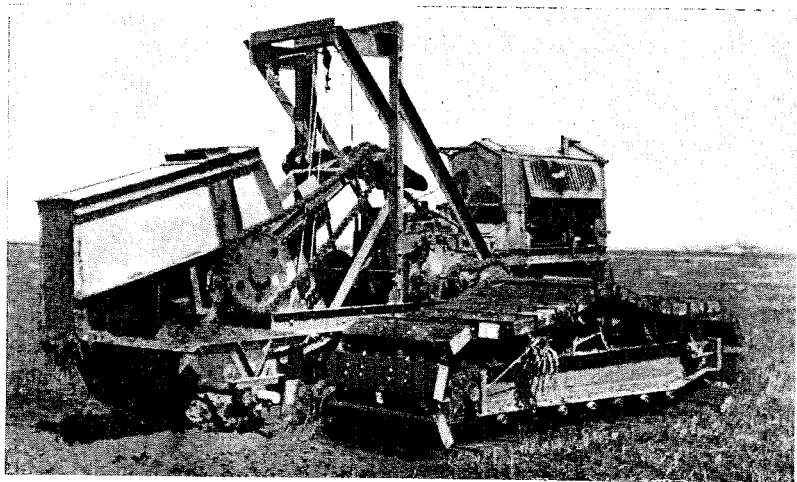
Photo M. 11-122. Close up view of converted machine with digging unit in position to dig 20" deep ditch. Spoil is discharged on meadow surface back of near track.
